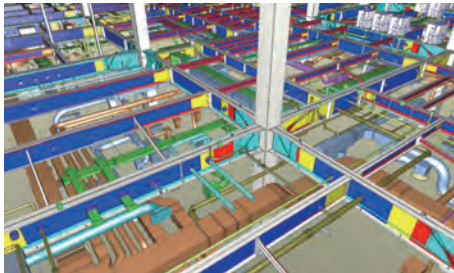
Fixing of ceiling inside equipment and coordination of steel-frame sleeves
